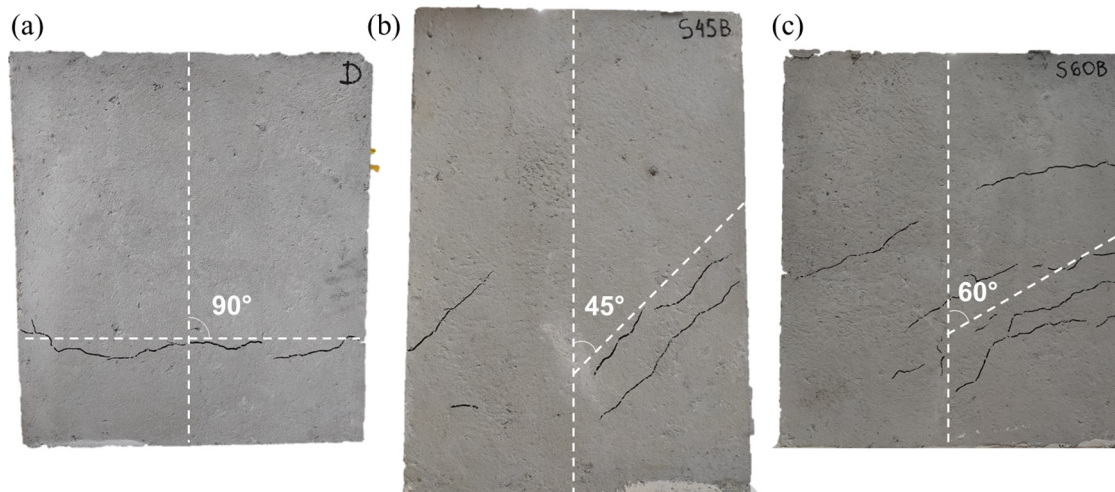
Crack pattern on the concrete slab top surface:
